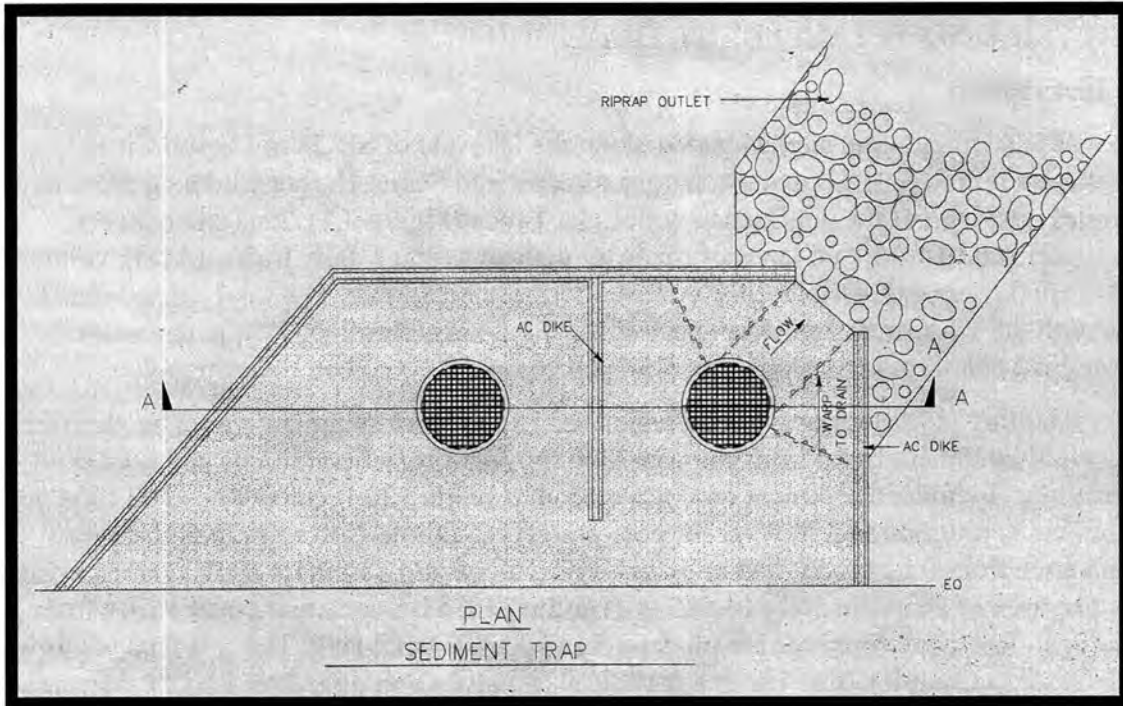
Plan view of typical NDOT double barrel sediment trap BMP (Section A-A shown in Figure 4.1b).
